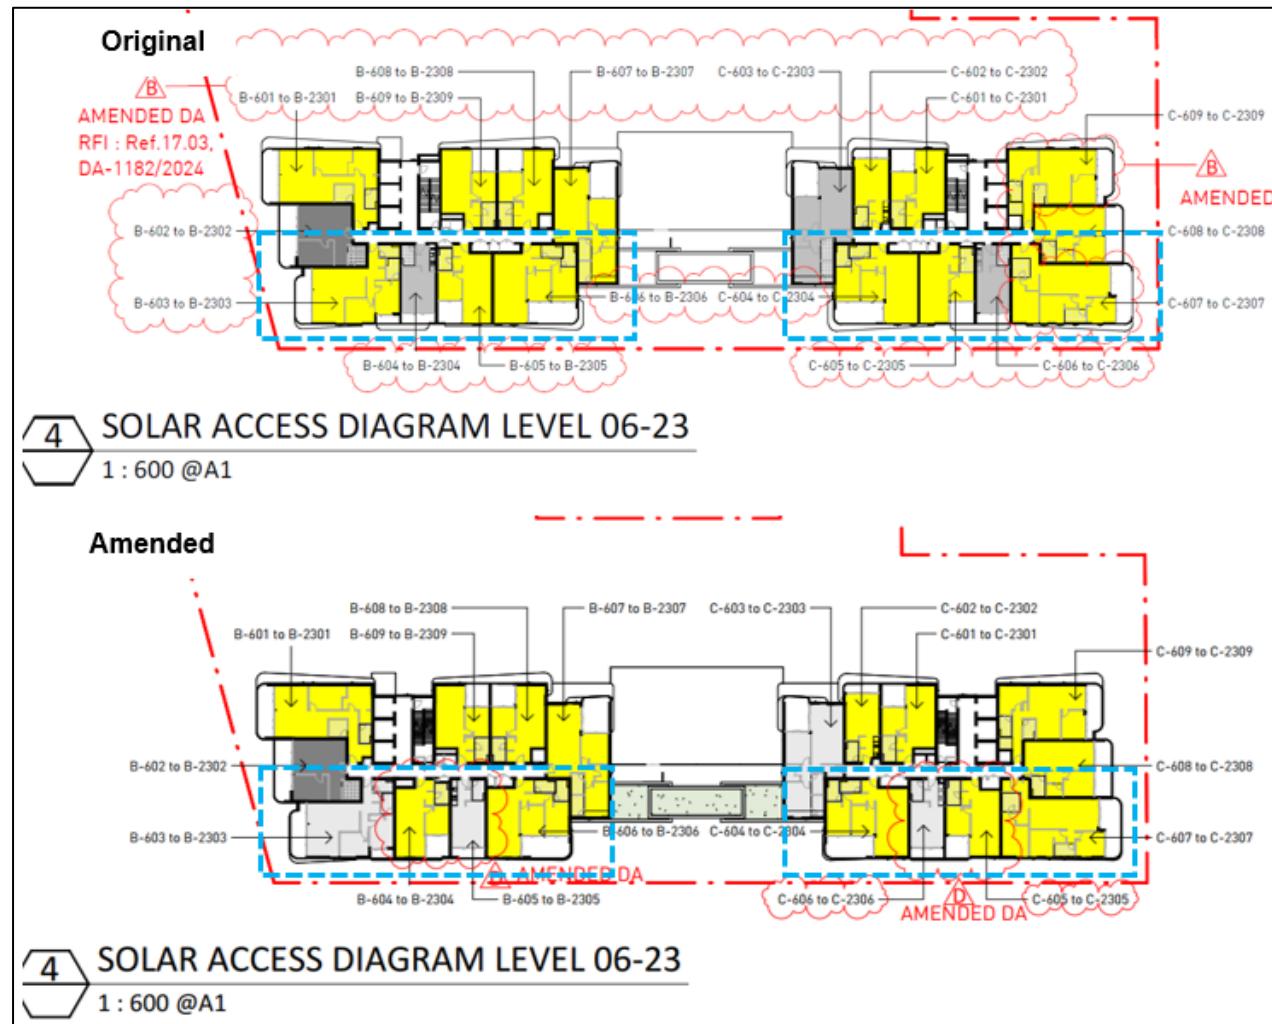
Original (top) and proposed amended (bottom) solar access diagram (Source: PTW Architects)
